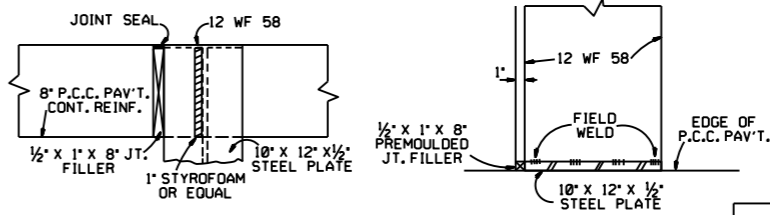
DETAIL OF END PLATE ATTACHMENT TO WIDE FLANGE BEAM
